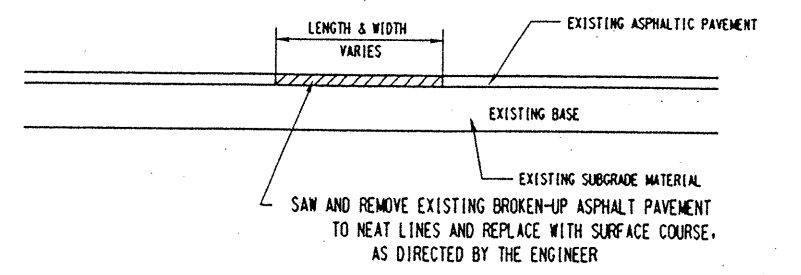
DETAILS OF REPAIRING EXISTING PAVEMENT PRIOR TO RESURFACING FOR FULL DEPTH AND MILLING
